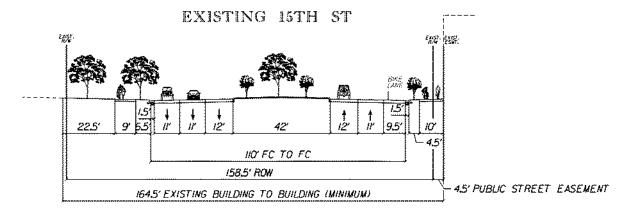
Existing 15th Street S Cross Section (looking east toward Route 1)
